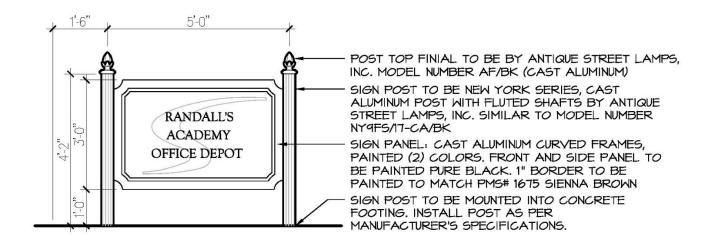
Sign Type B – Major & Secondary Anchor Tenants, Major Construction Project ID Sign
